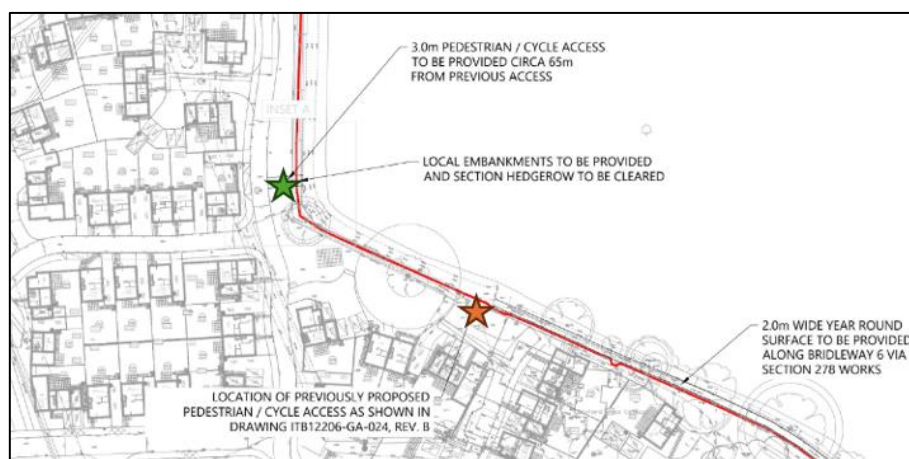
Plan showing original access (orange) and proposed access (green) and bridleway 6
